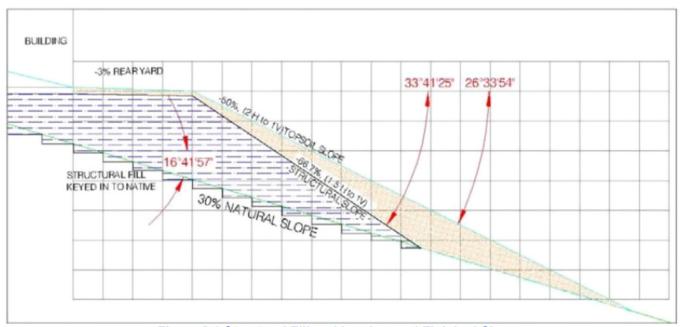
Structural Fill and Landscaped Finished Slopes
